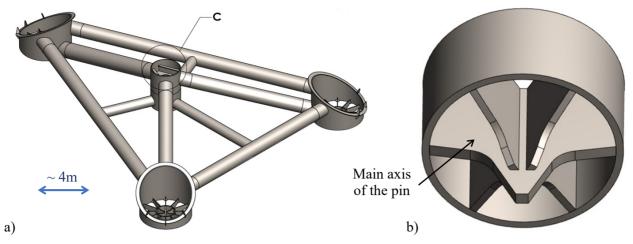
View of the statically determined foundation structure with the 3 pins foundation – after (HydroQuest)
